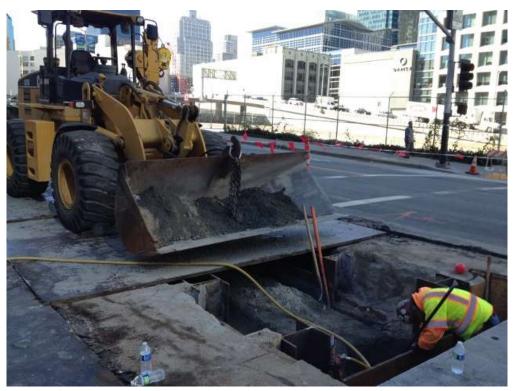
Exposing I-beam shoring on Folsom Street in front of Embarcadero Substation. View southwest, November 3, 2015.
